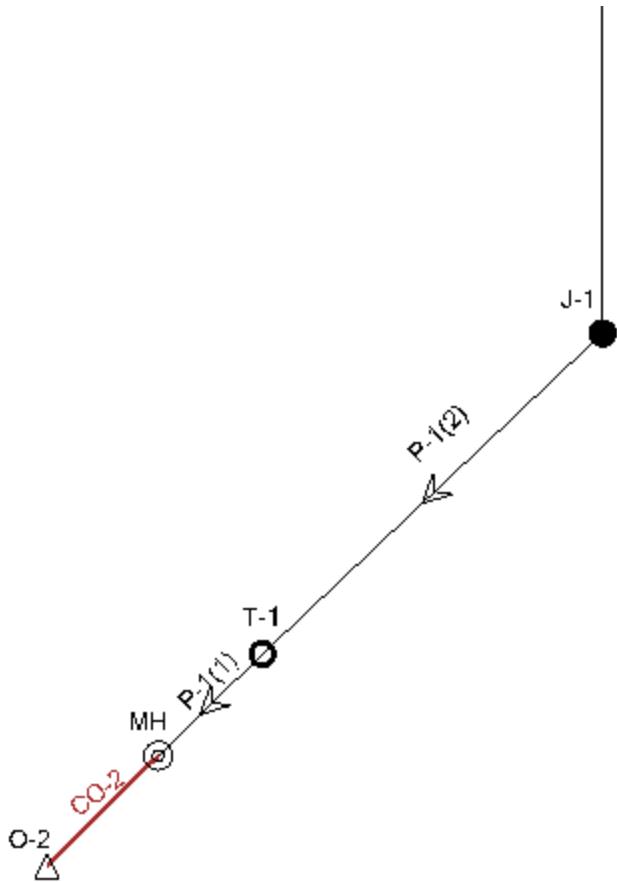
SewerGEMS Floor 1 Layout to City Main Pipe
